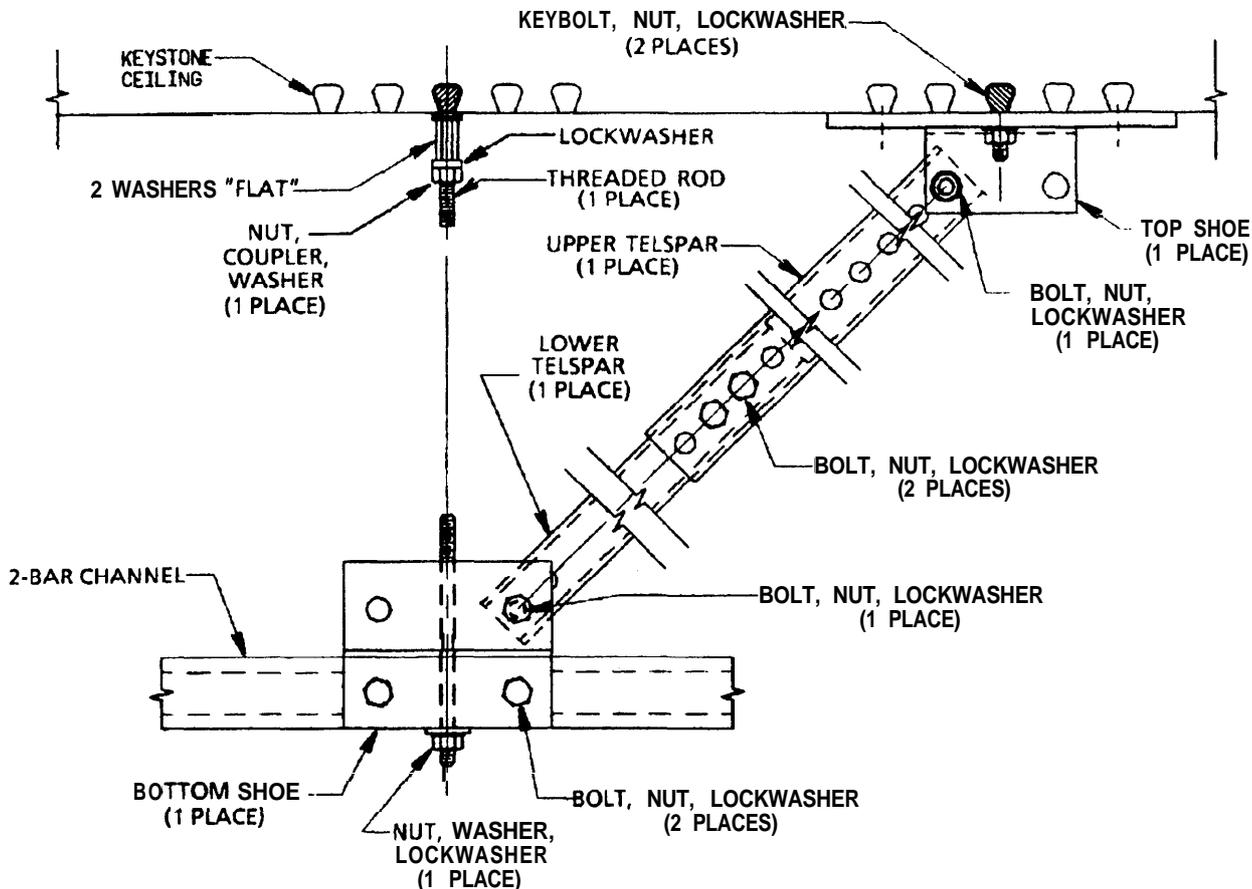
Single V-Bracing With Thread Rod and TELSPAR Assembly.
